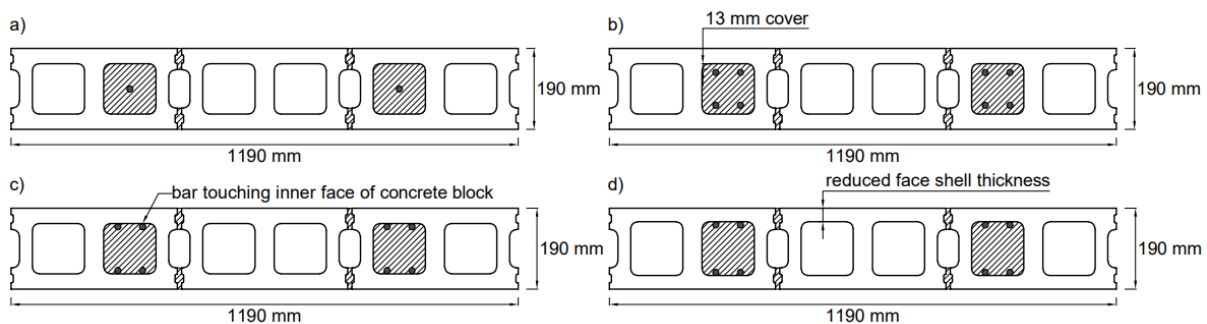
Schematic drawings of cross-sections of the analyzed walls (a) Section 1, rebar at the centre (b) Section 2, two layers of reinforcement with 13 mm inner cover (c) Section 3, two layers with no inner cover (d) Section 4, CMU with reduced face shell thickness.
